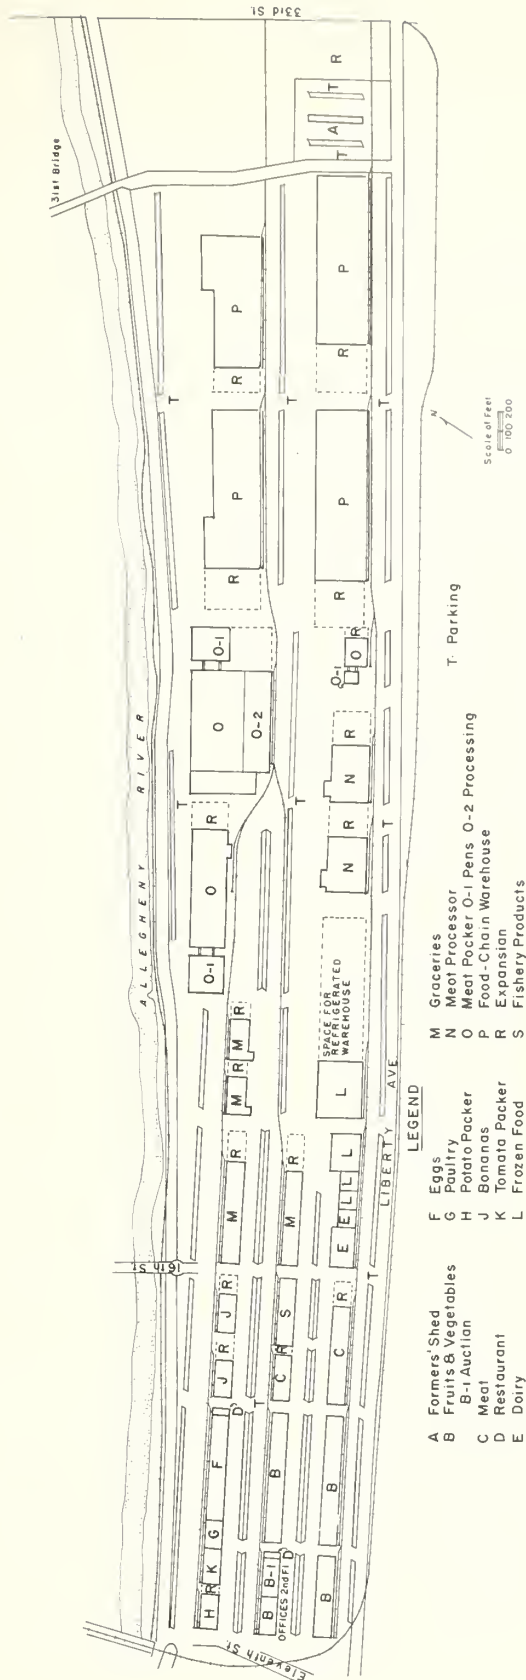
Arrangement of proposed facilities on the Strip site.
